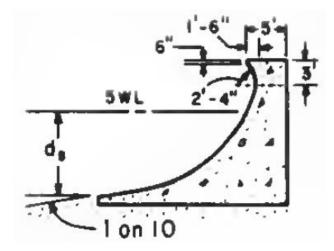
Cross section of a typical wave return wall (Shore Protection Manual 1984).
